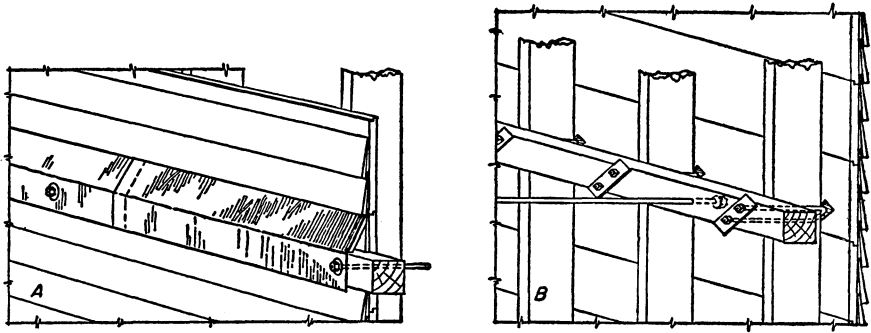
Methods of reinforcing wall for supporting grain loads. *A*, Exterior stay timber with flashing. *B*, Inside stay timber secured to studs with U-bolts. The tie rods extend through the stay timber. Such tie rods are in the way unless they are above head height, but are an economical means of providing wall strength for bins filled and emptied infrequently.
